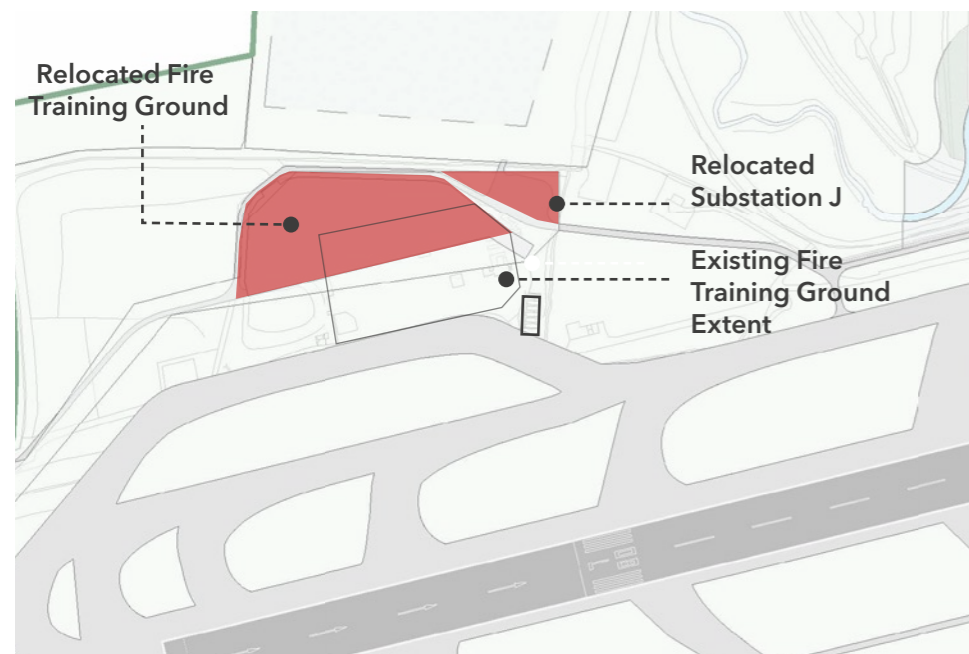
Fire Training Ground and Sub Station J Site Context Plan
